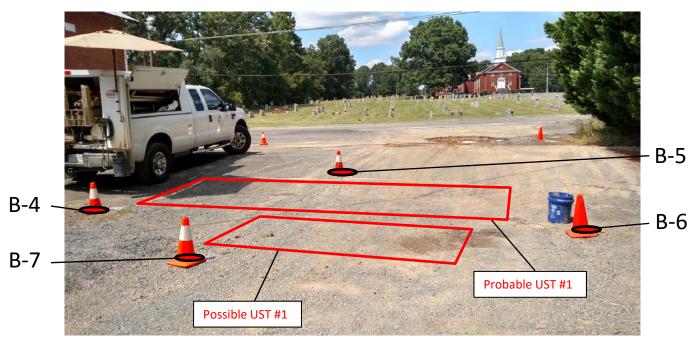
Boring locations B-4, B-5, B-6, B-7, surrounding the probable and possible UST, located just east of the on-site structure, facing north.
